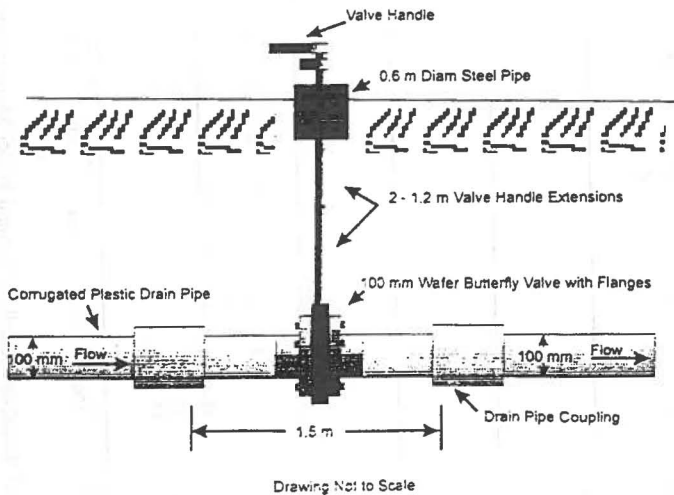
Schematic drawing of control valve used on subsurface drainage laterals in Broadview Shallow Ground Water Management Demonstration Project.
